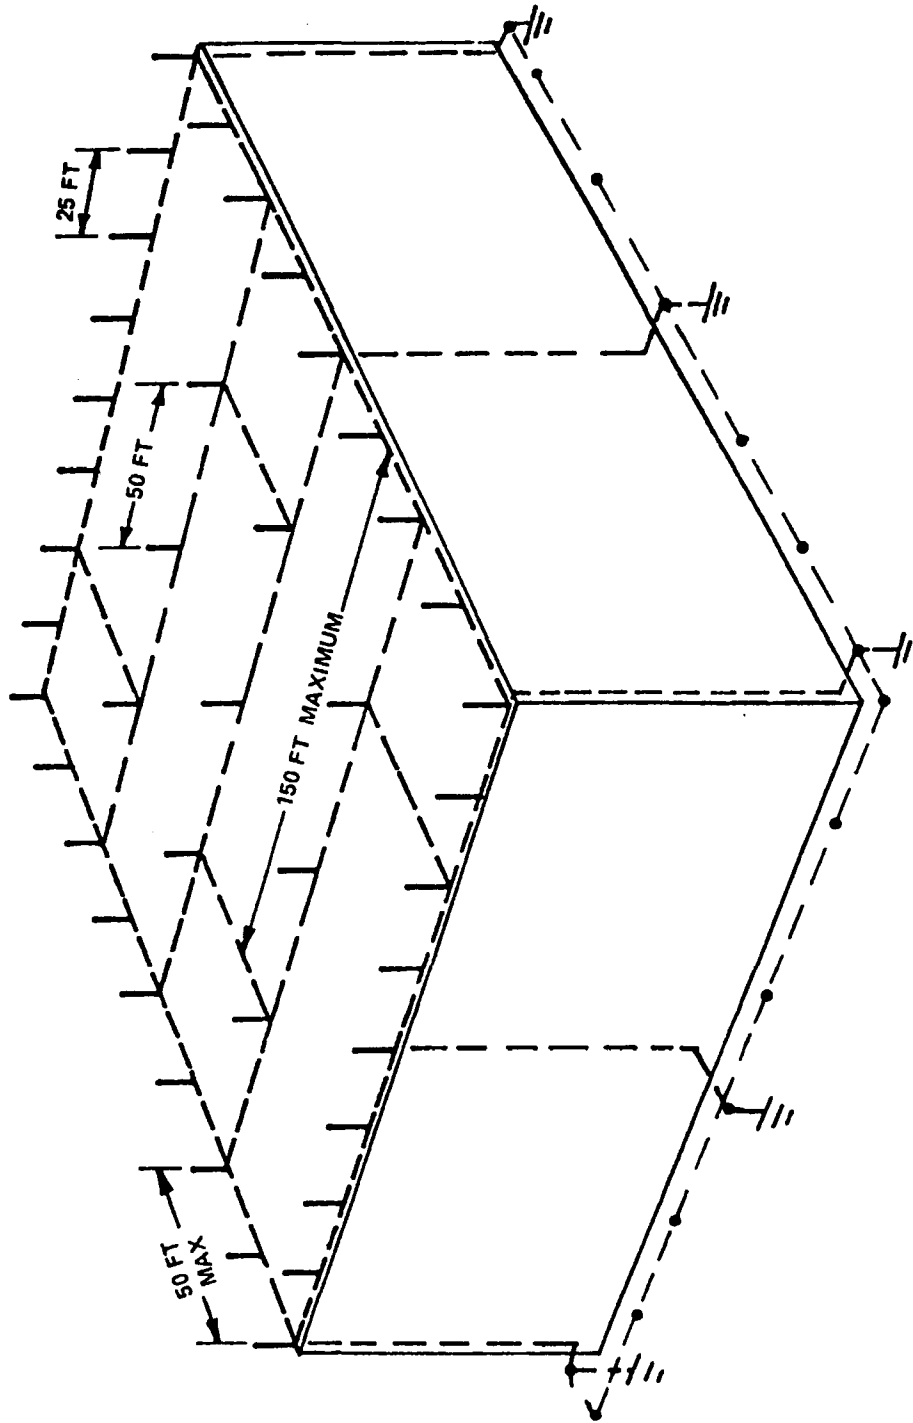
Air Terminal Placement on Flat-Roofed Structures
